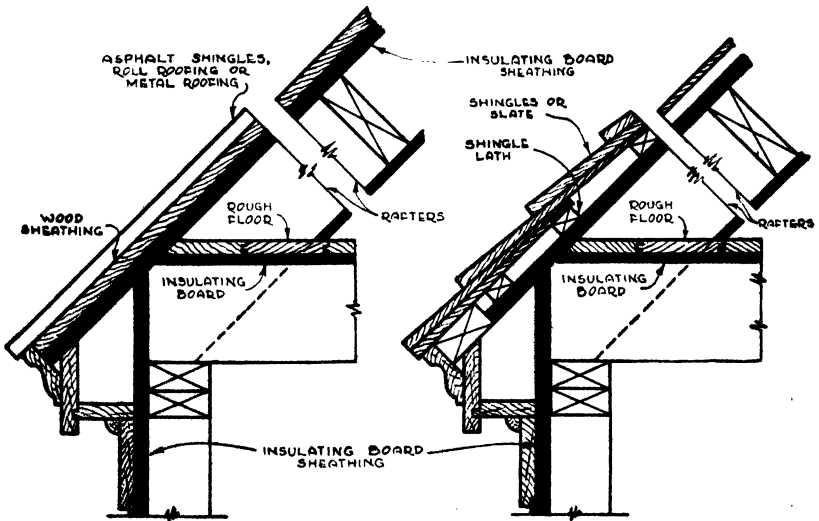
Two Sections through Eaves of Roofs Showing Wood Sheathing over Insulating Board to Receive Asphalt Shingles and Other Types of Roofing, and Shingle Lath over Insulating Board to Receive Shingles or Slate
